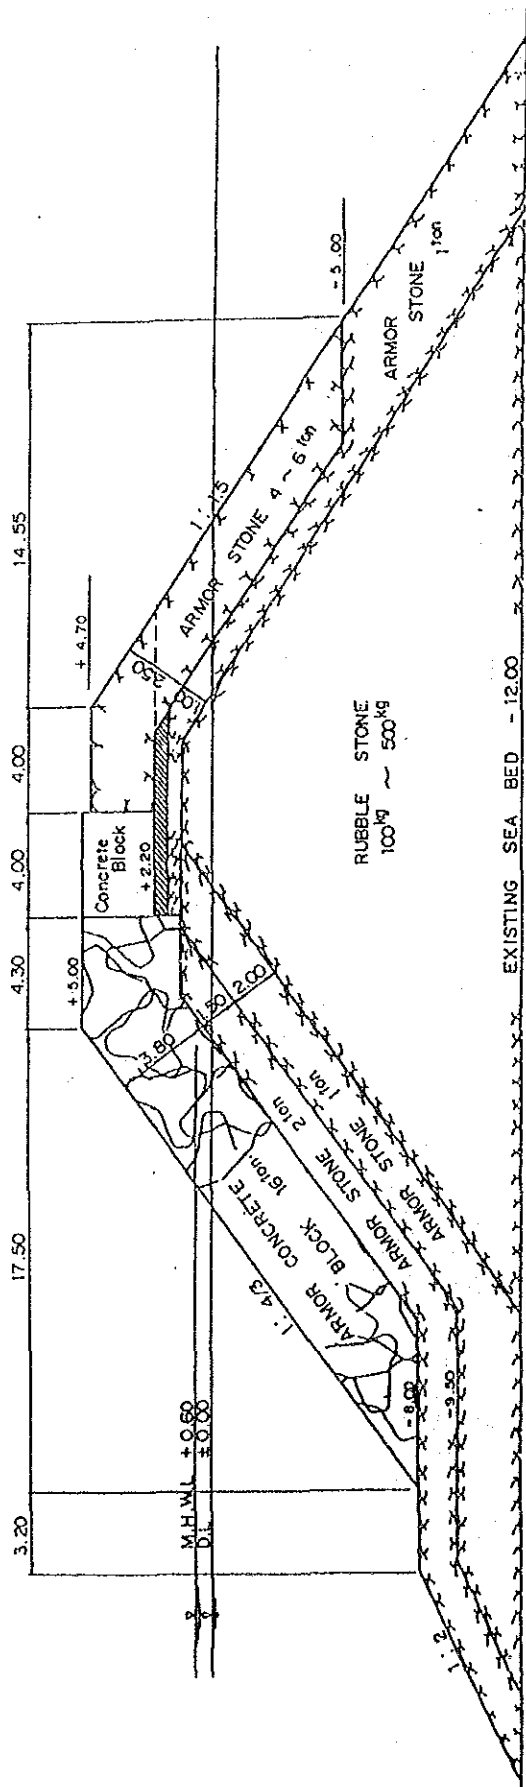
Typical Cross Section of Southwest Breakwater
